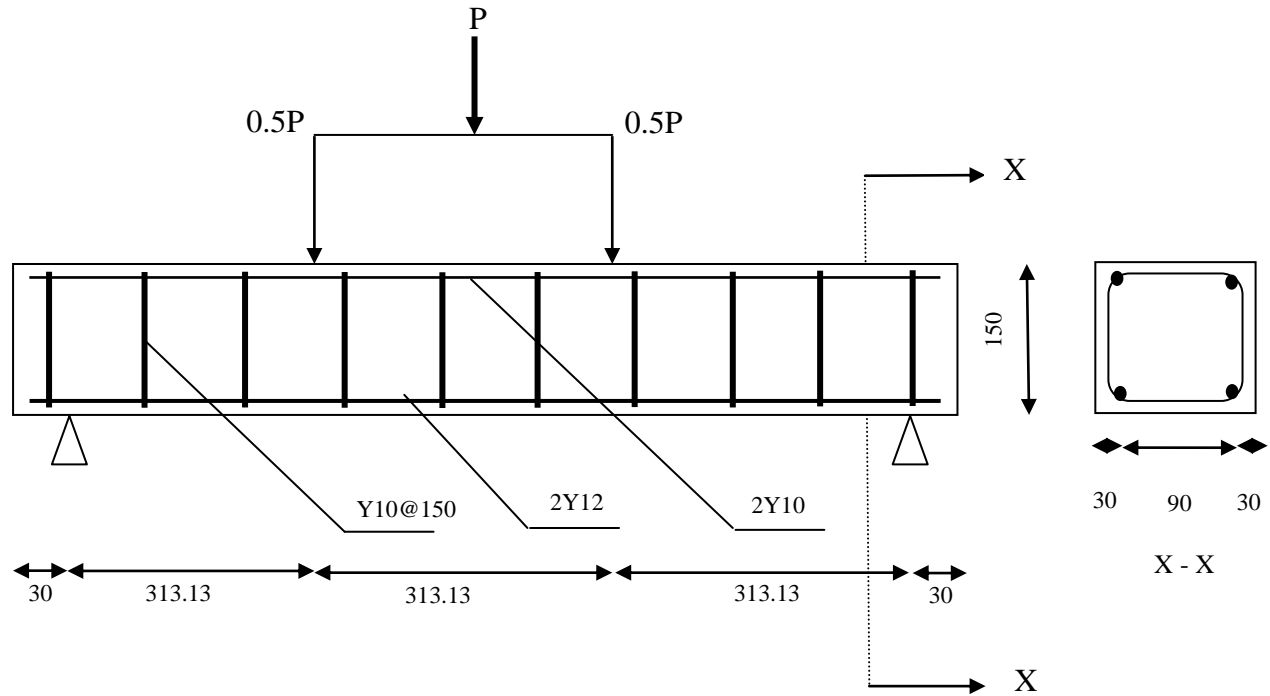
Details of Reinforced Concrete Beam Specimens and Loading Arrangement.
